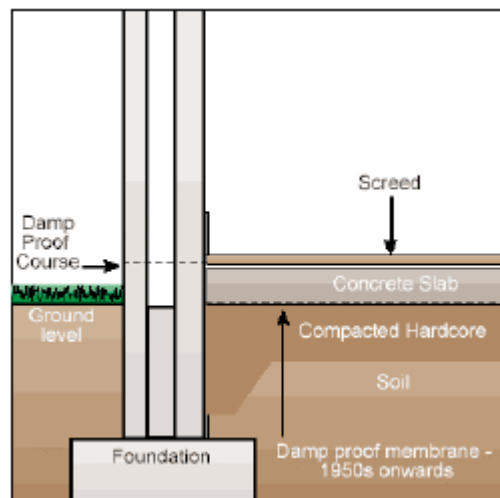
Example of Flood Resilient Floor - Solid Concrete Floor (CIRIA, 2003)
